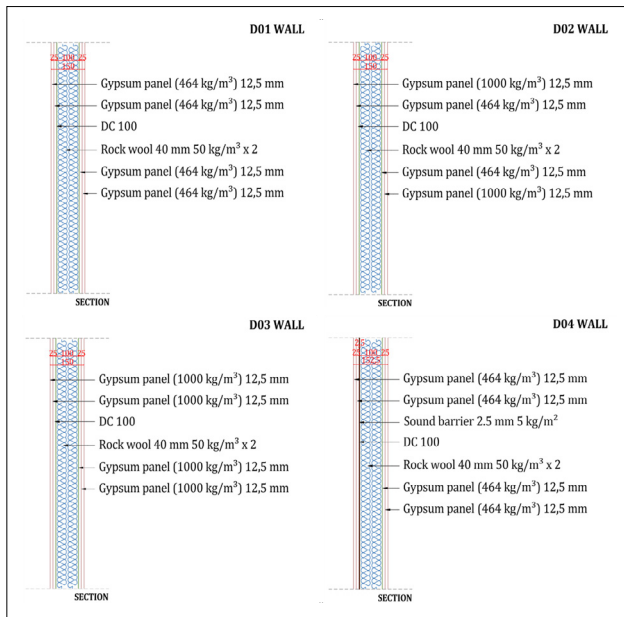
Single-Frame Gypsum Board Partition Wall Systems Manufactured at TSE (Credit to authors).
